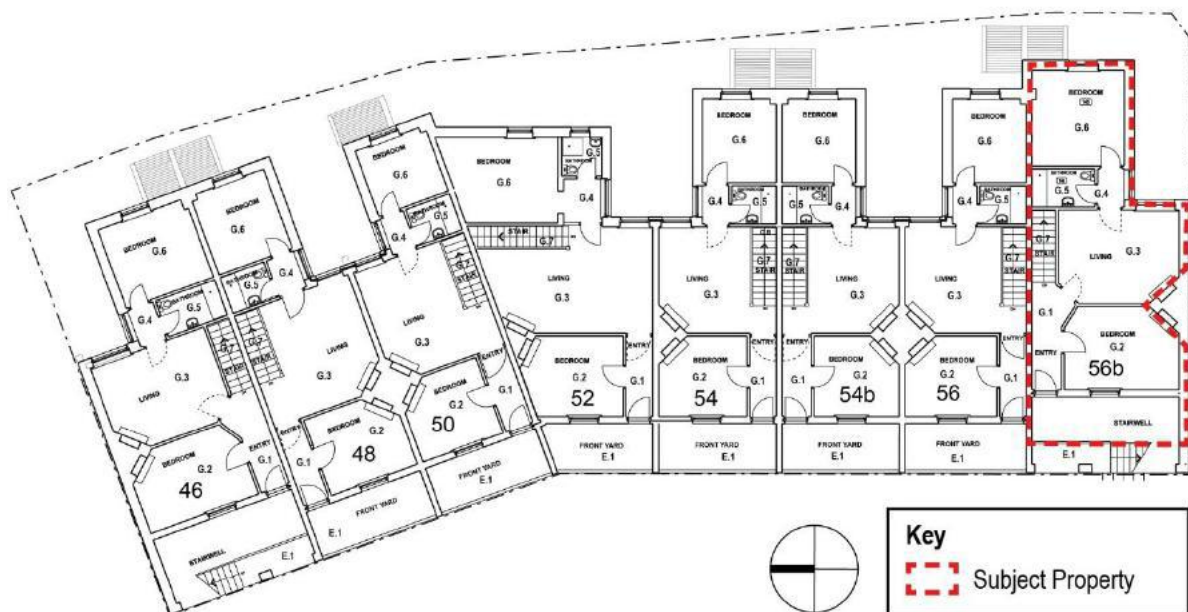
Subdivision plan—Flat 56B / 46–56 Gloucester Street is indicated by red dashed outline. (Source: LAHC, with GML overlay 2016)
